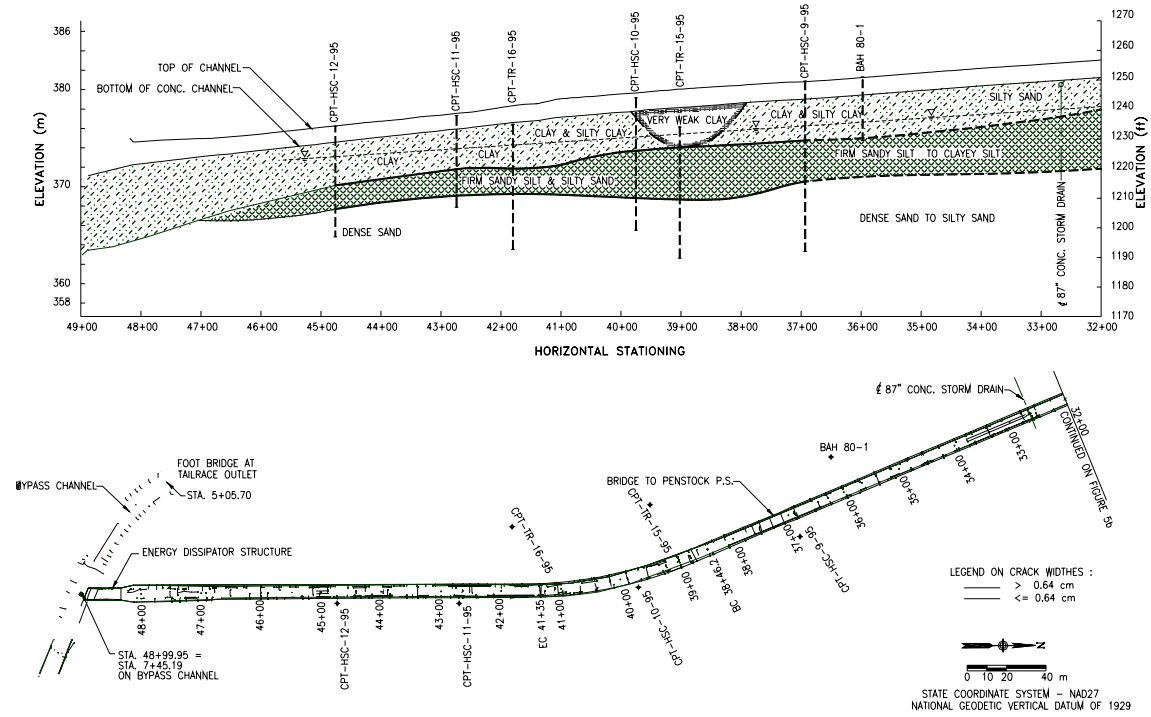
High Speed Channel plan and profile showing crack locations, CPT locations, and interpreted subsurface soil conditions.
